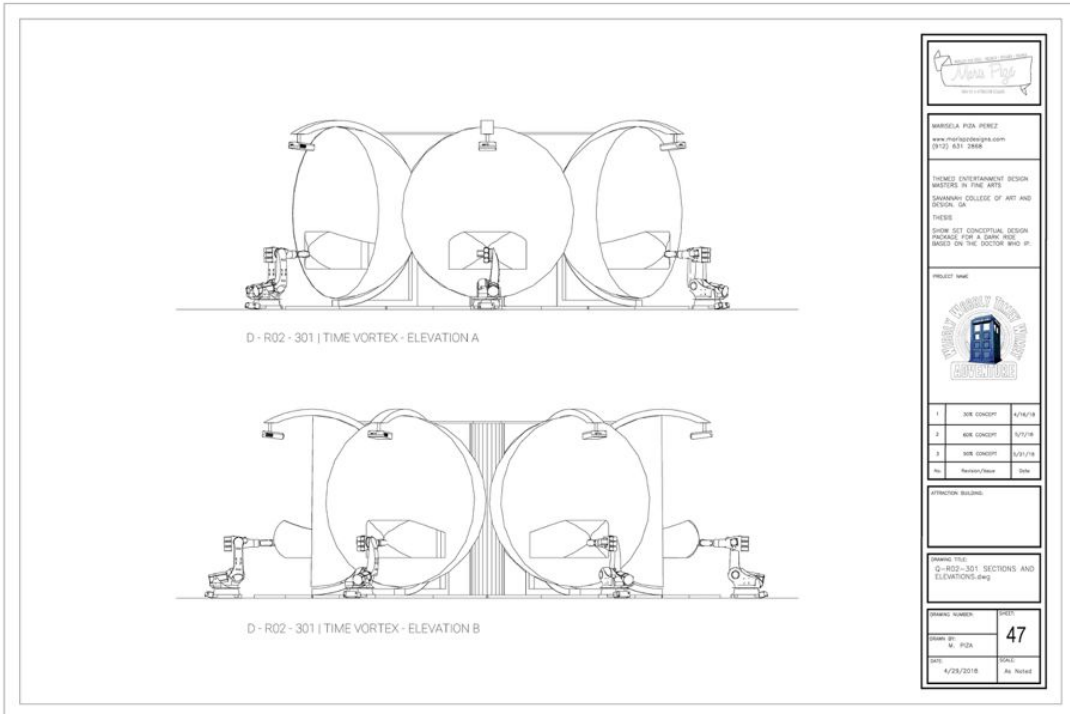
D-R02-301 | Time Vortex - Sections and Elevations
